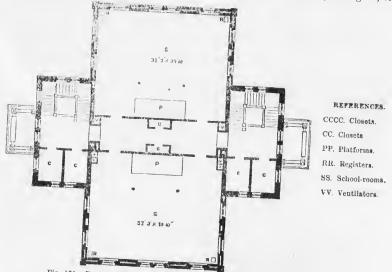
Plan of Ground Floor, adapted to Fig. 192.
